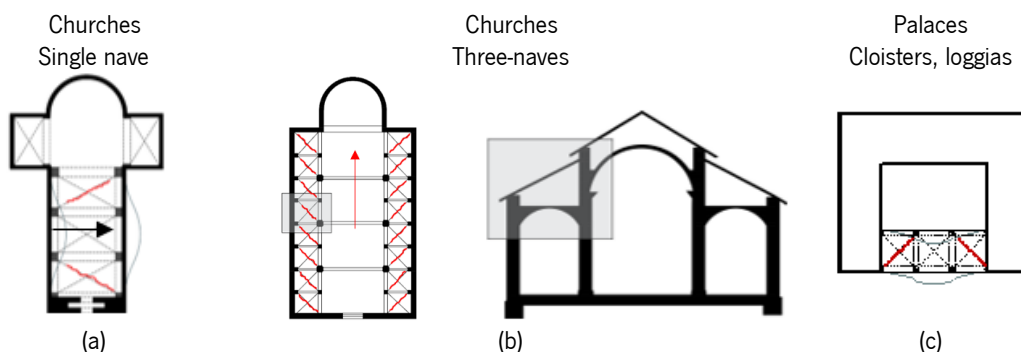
In plane-shear mechanism: (a) plan view of single nave church, (b) plan view and transverse section of three-naves church, (c) plan view of a cloister in a palace (Rossi, 2015).
